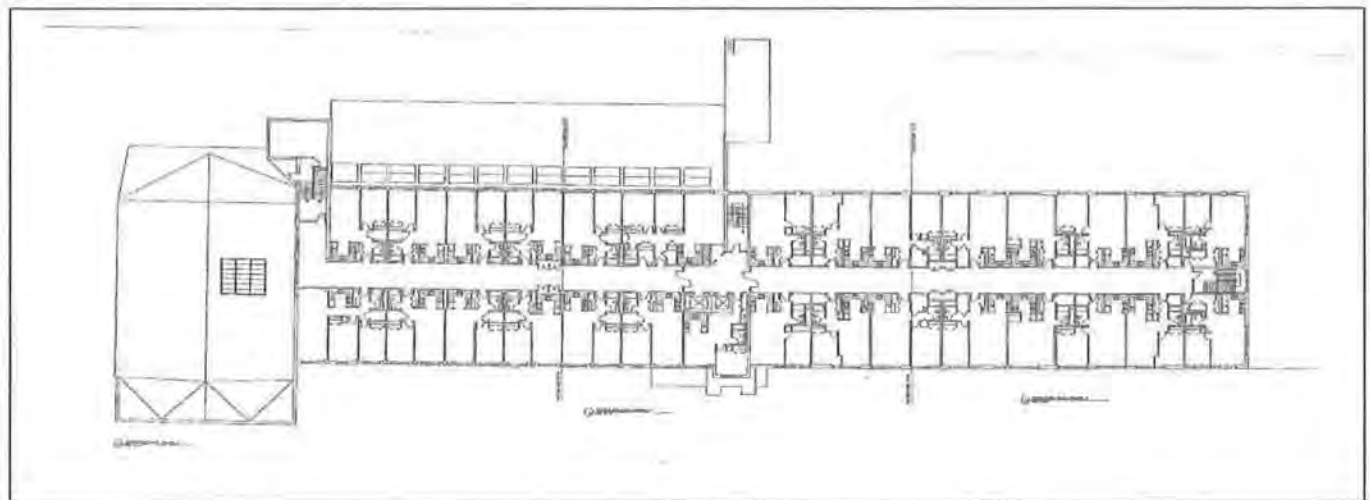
G: Existing Floor Plans – Building 2 Third Floor
